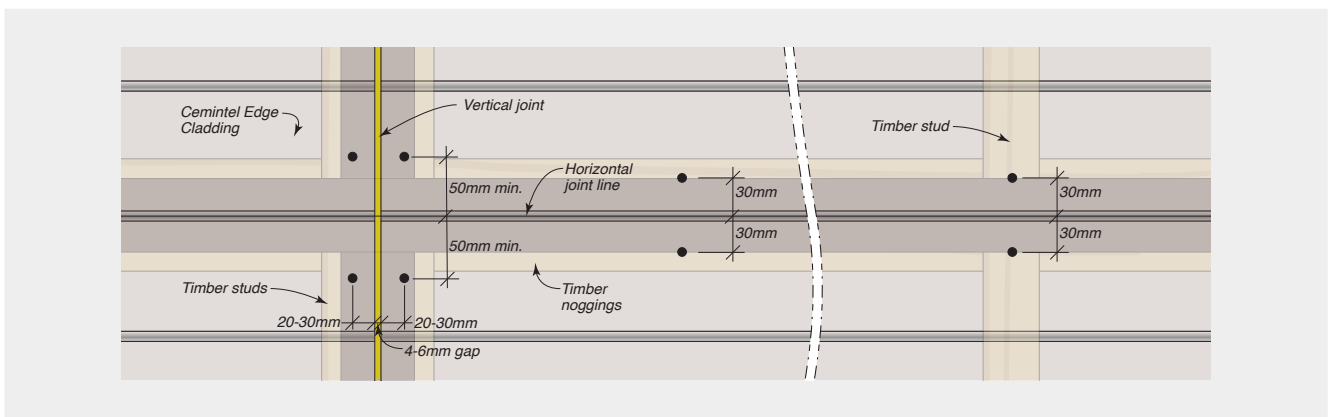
NEW: Direct Fix connection layout to framing
